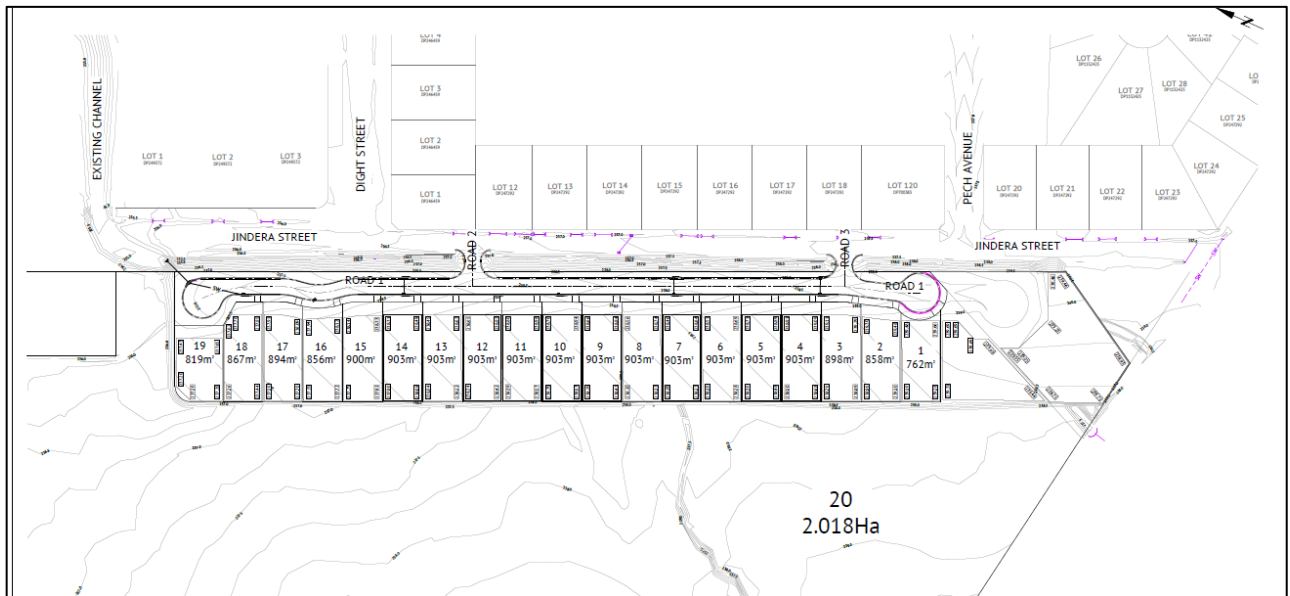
An overview of the proposed subdivision layout by the Applicant.
